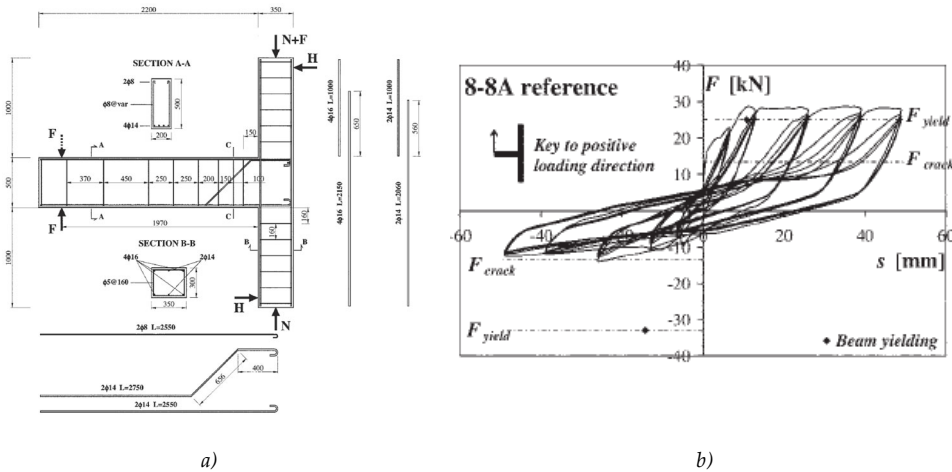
Full scale exterior T-joint with beam reinforcement amount deficiencies: reinforcement detailing a) and capacity curve b) (Russo and Pauletta, 2012).
